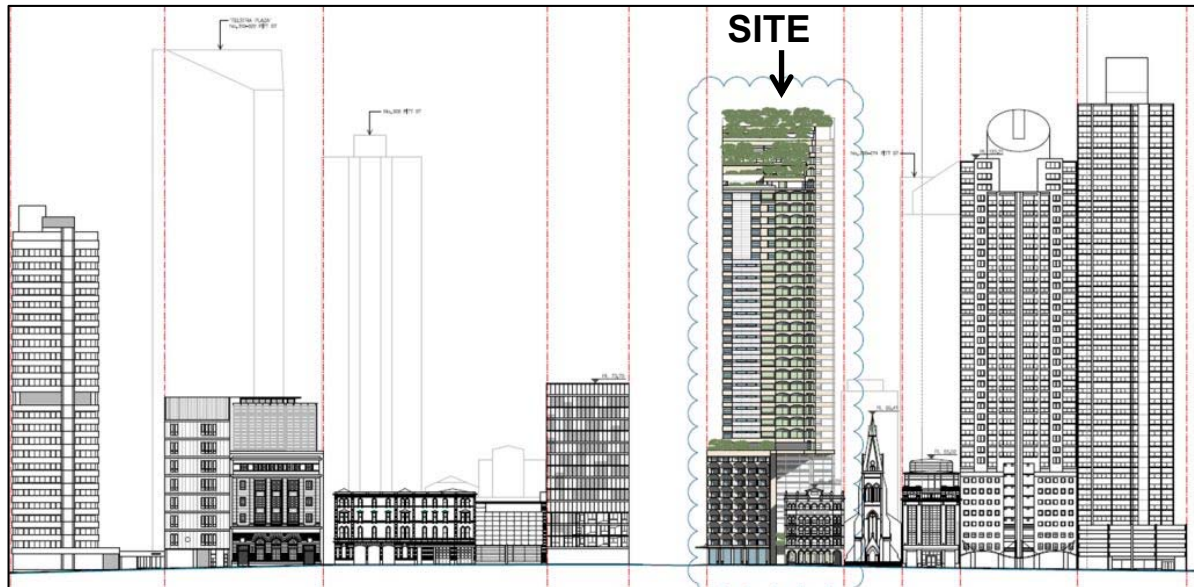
The proposed development as viewed in its Castlereagh Street context (western elevation)
